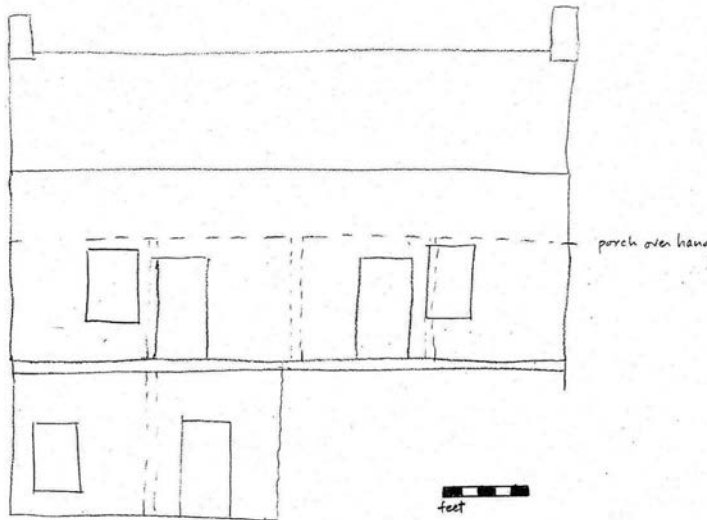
Abraham Traver House, front (east) façade as built. Sketched by Neil Larson, 1991.
